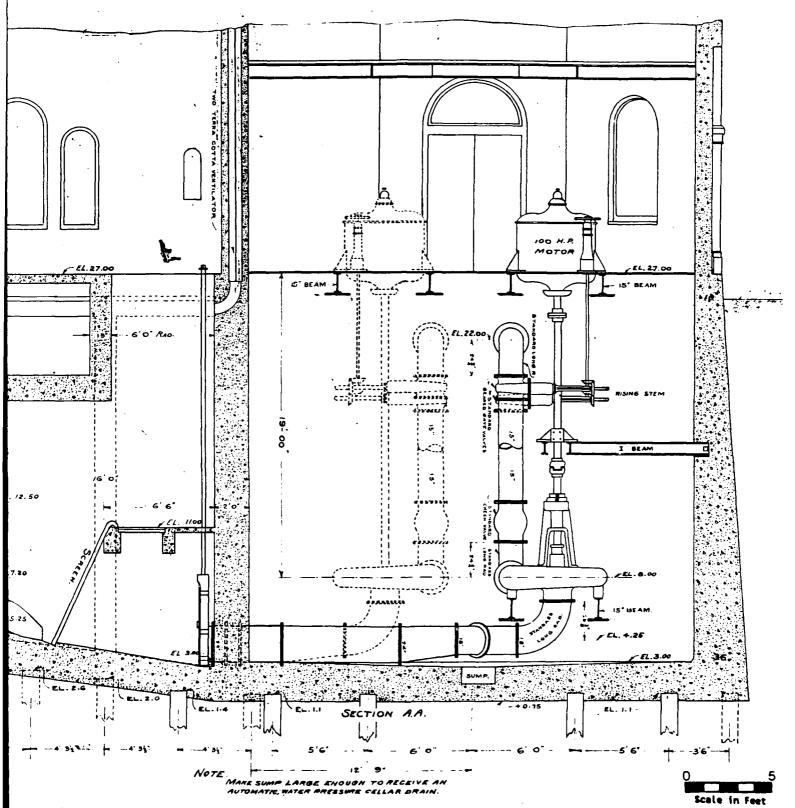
Cross-section AA (refer to Figure 12) showing plans for machinery and piping in Station B (reproduced from Drawing No. 976-A-10 dated 1903, Sewerage and Water Board files).
